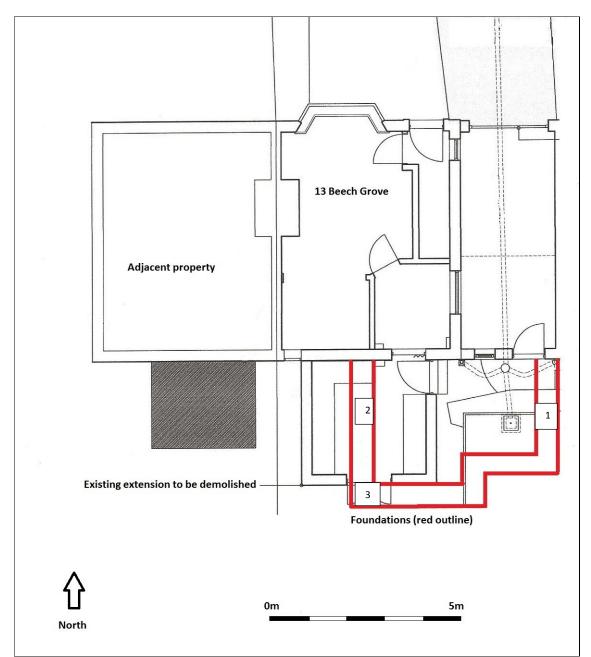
Ground plan regarding the proposed development (study area outlined in red).
